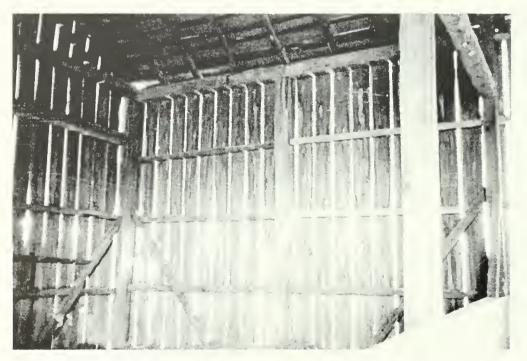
Interior of the barn showing the gaps providing ventilation between boards of wood siding.
